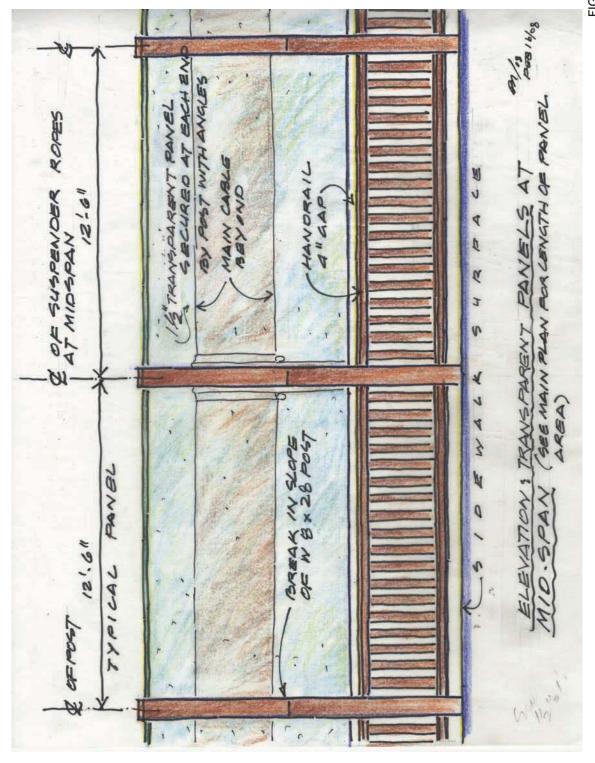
ELEVATION OF TRANSPARENT PANELS AT MID-SPAN
